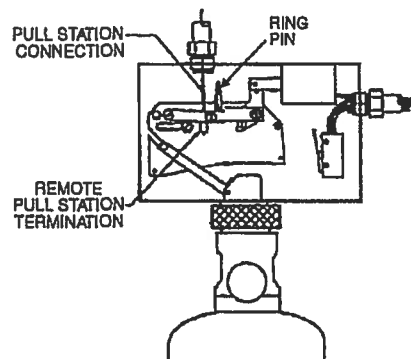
Single Cylinder Installation Using Model MCH3/ECH3/NMCH3 Control Head
